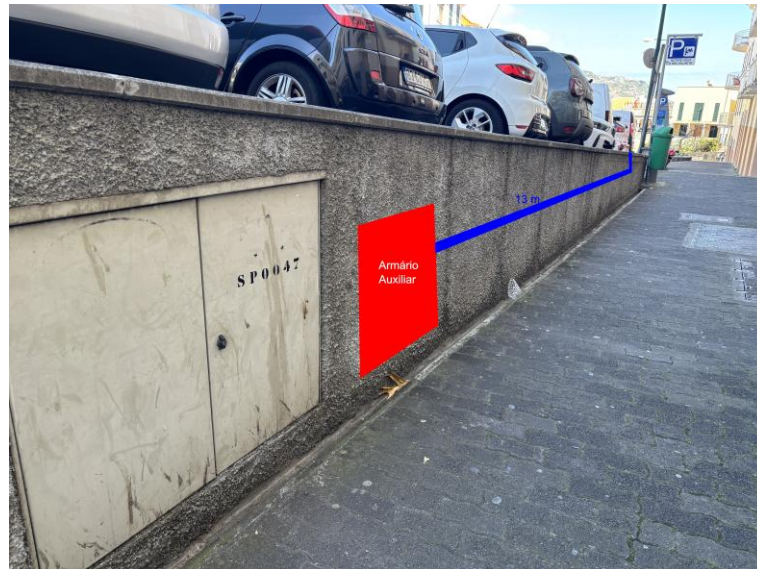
Location of the auxiliary cabinet to be embedded in the wall and the corresponding connection route.
